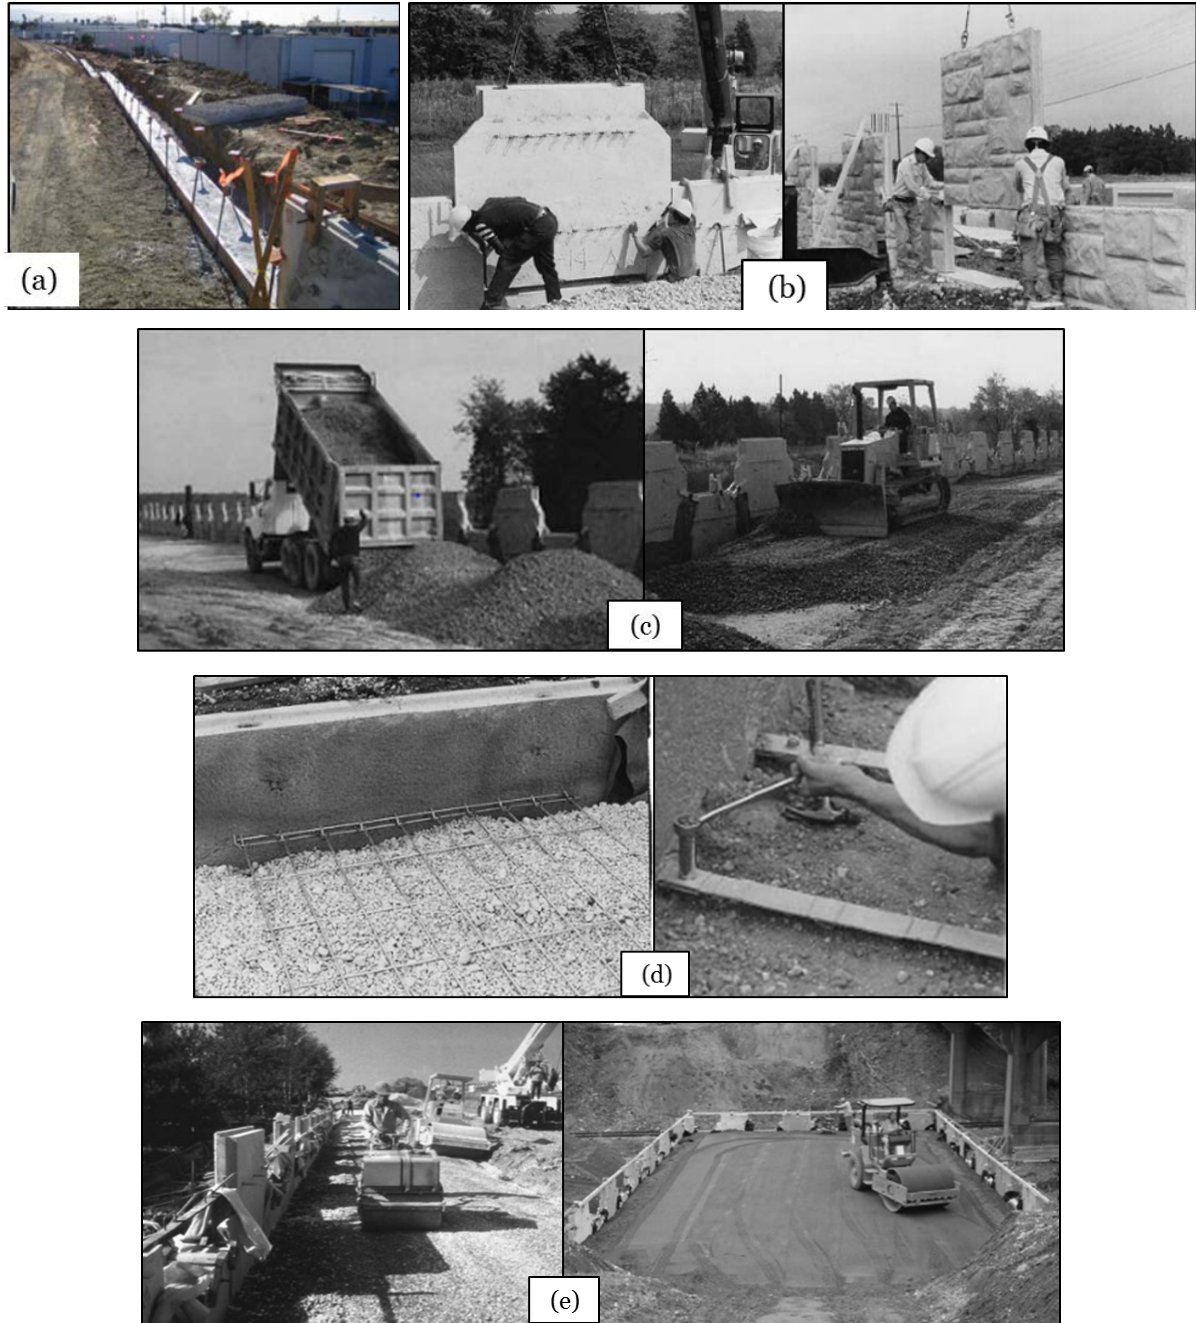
34 Construction sequence of MSE wall with precast panel facing; (a) Leveling pad (Passe, 2000); (b) Precast panels erection; (c) Fill material spreading; (d) Placement and connection of reinforcement; (e) Compaction of reinforced fill material (Berg, 2009).
